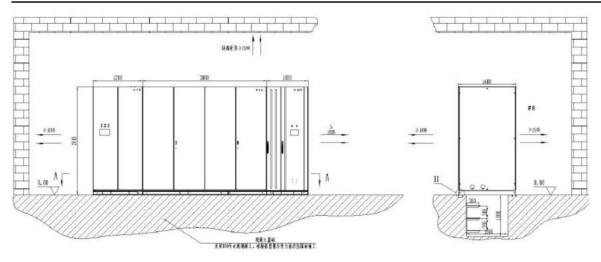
LEHSVG-10/4-W installation foundation diagram
